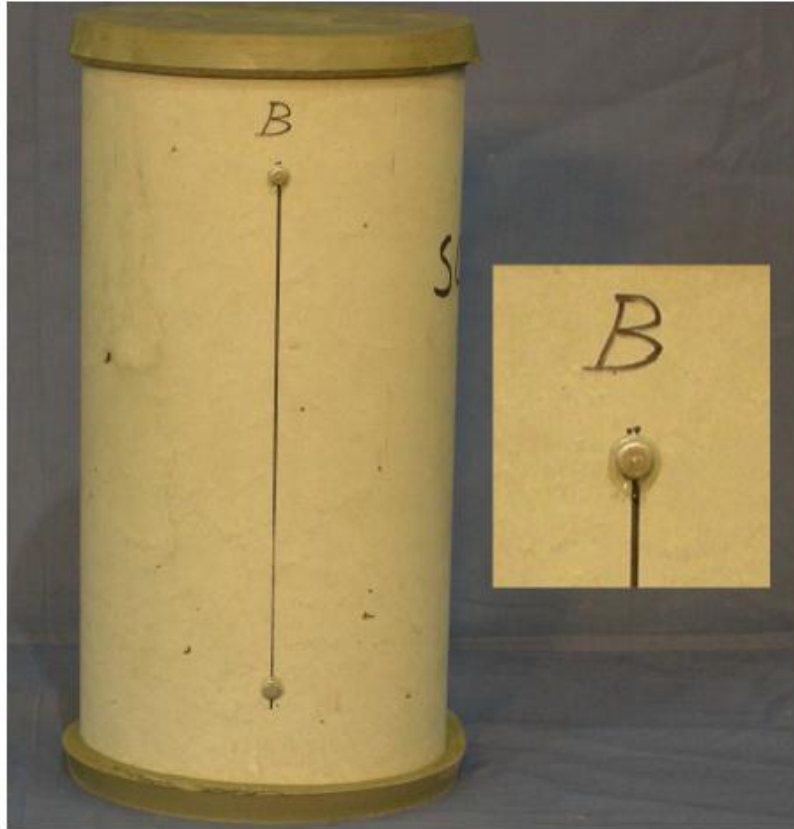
A Concrete Cylinder with DEMEC Points (Kavanaugh 2008)
